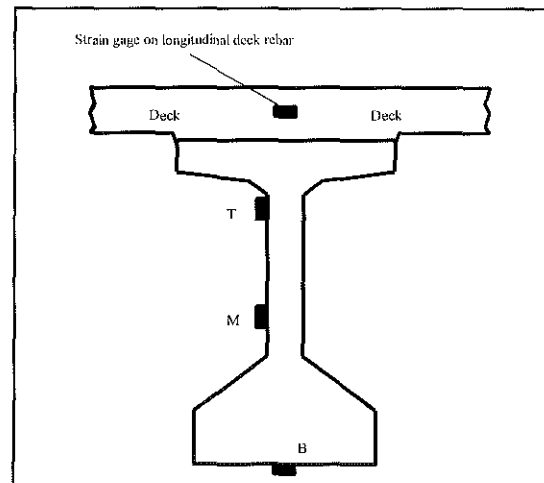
Strain Gage Location on Girder Cross Section and Deck.
